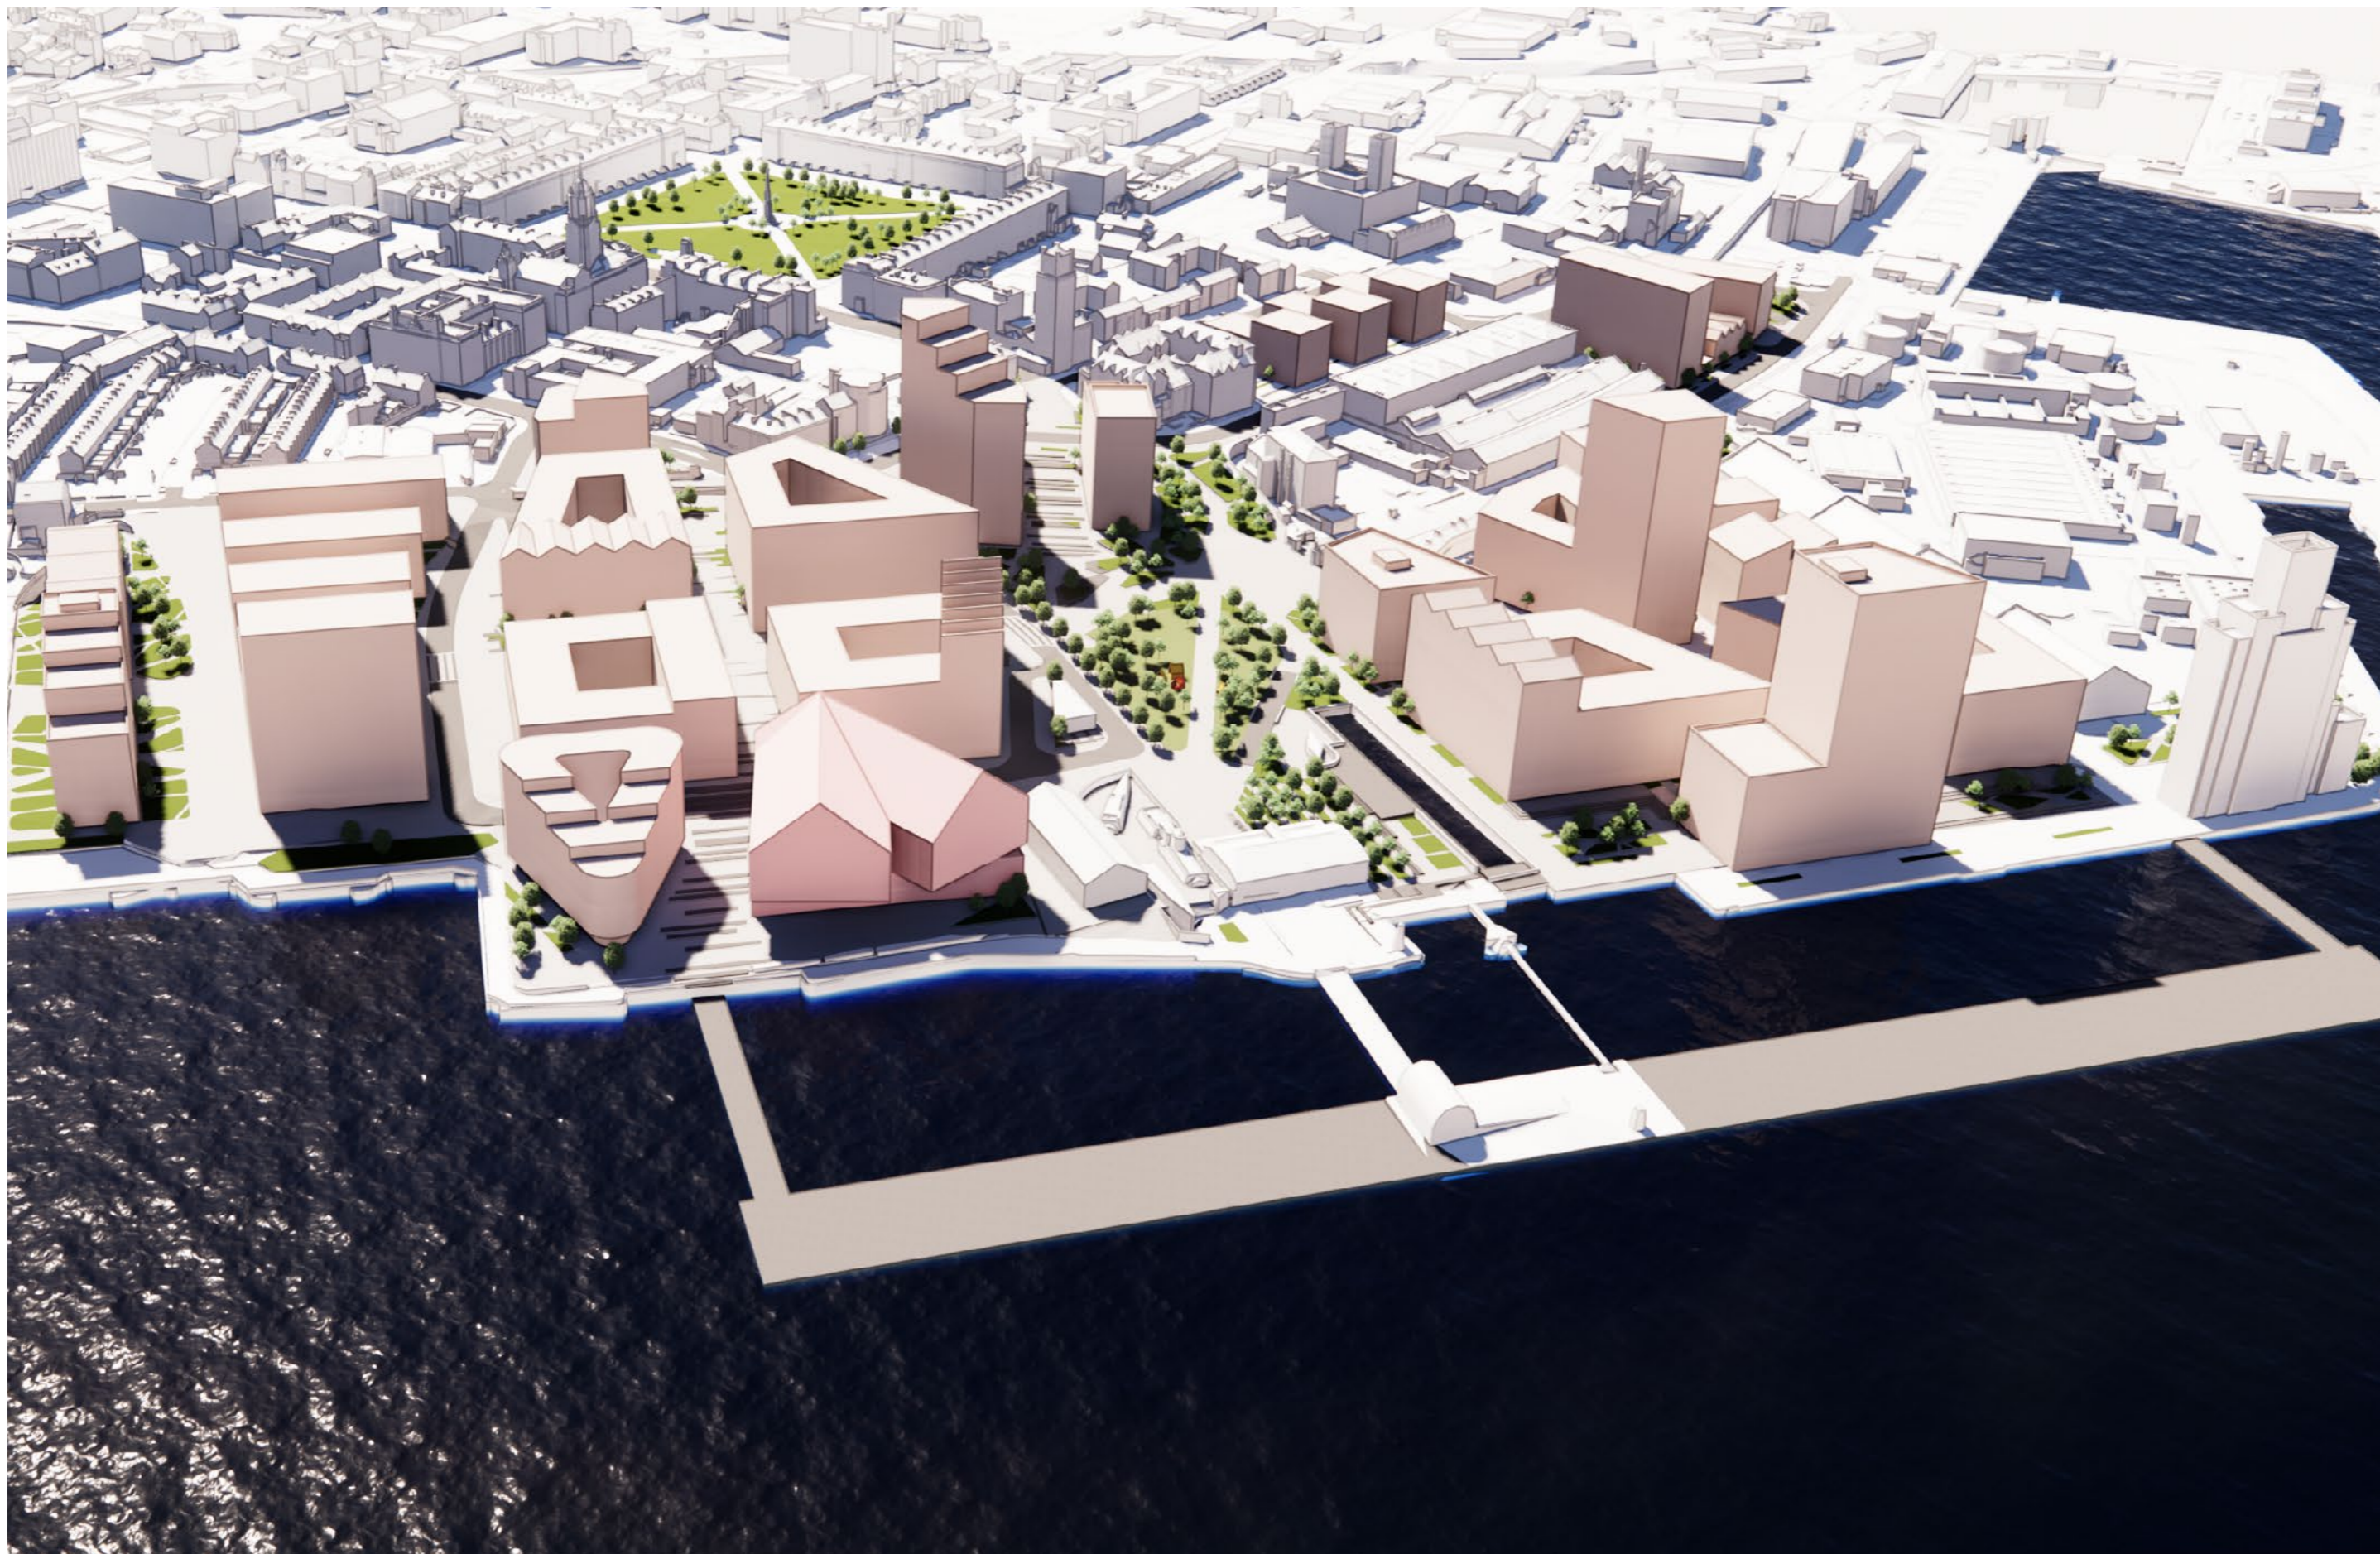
Illustrative Masterplan Proposed Building Heights
